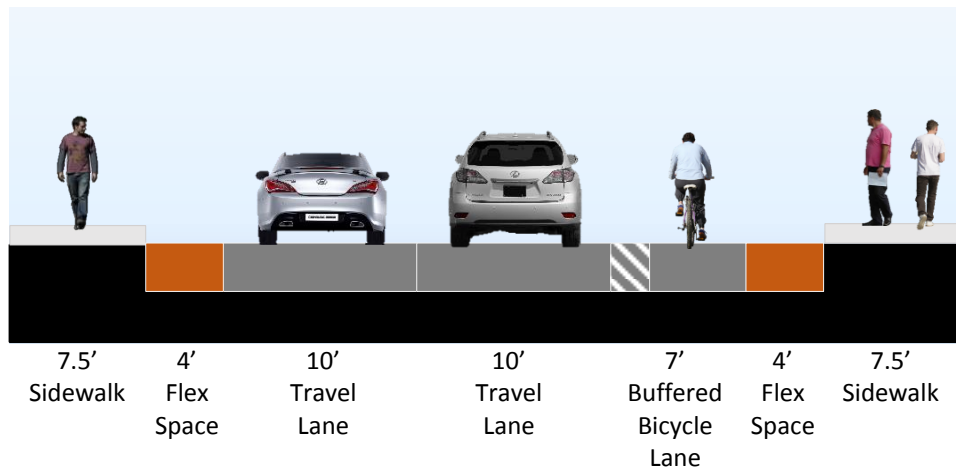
Florida Avenue Alternative 1 Typical Cross-Section
